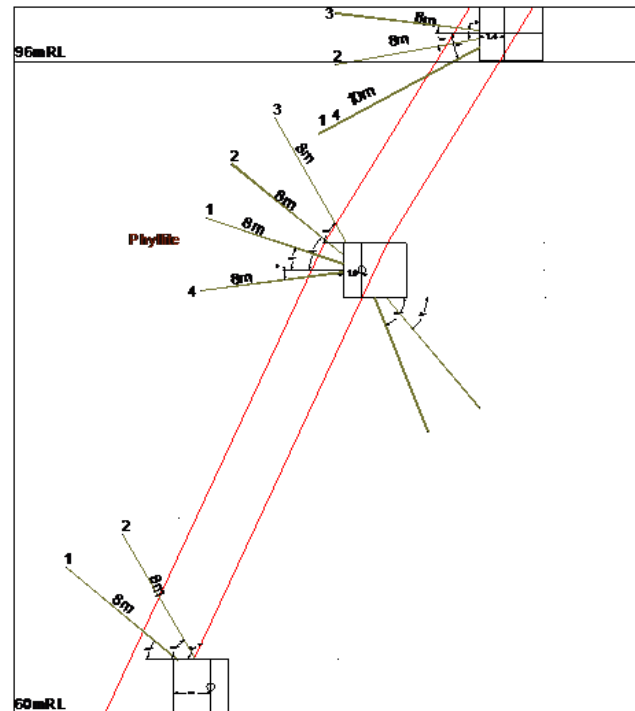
Cable Bolting For Wall Rock Pinning
